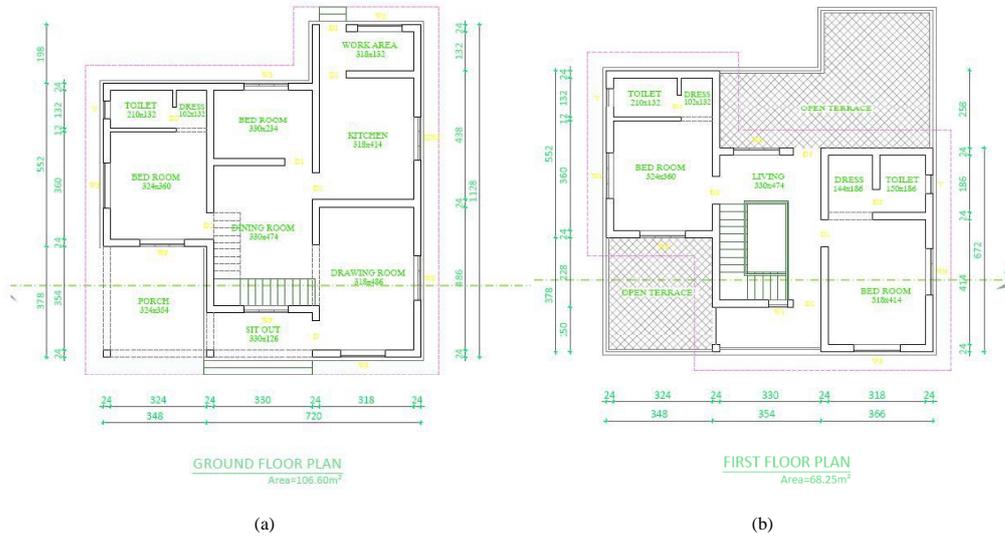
(a) Ground Floor Plan (b) First Floor Plan
